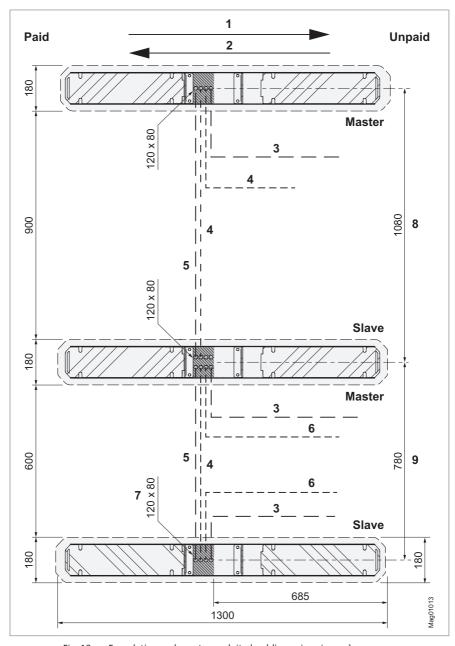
Foundation and empty conduit plan (dimensions in mm)
